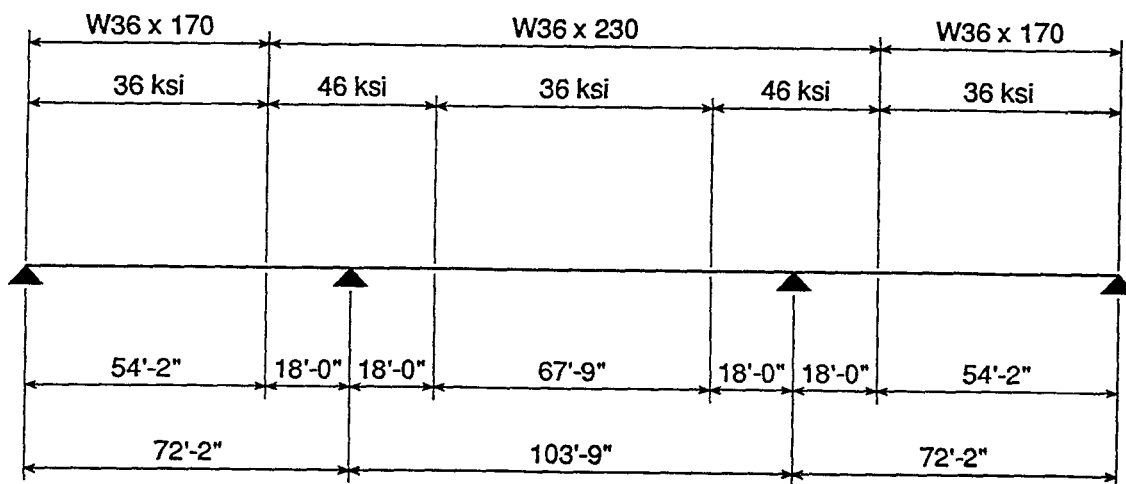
Girder Details for 3-Span Continuous Bridge at CBD Interchange
